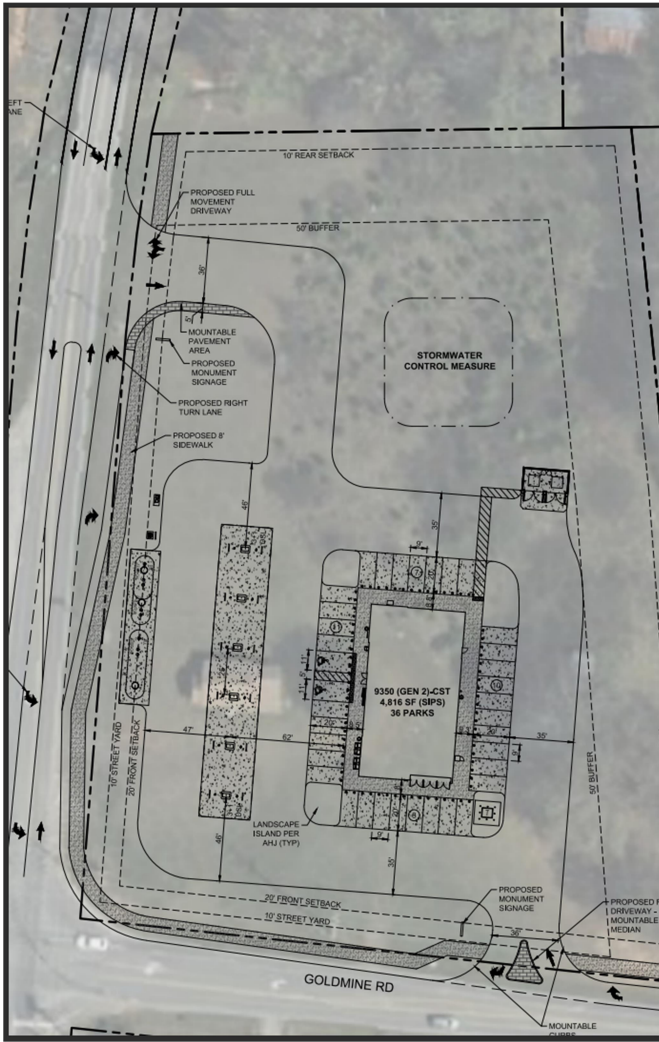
Site plan excerpt depicting proposed full-movement access, right-in/right-out driveway, turn-lane improvements, and roadway-oriented circulation. Source: Concept Site Plan #2.
